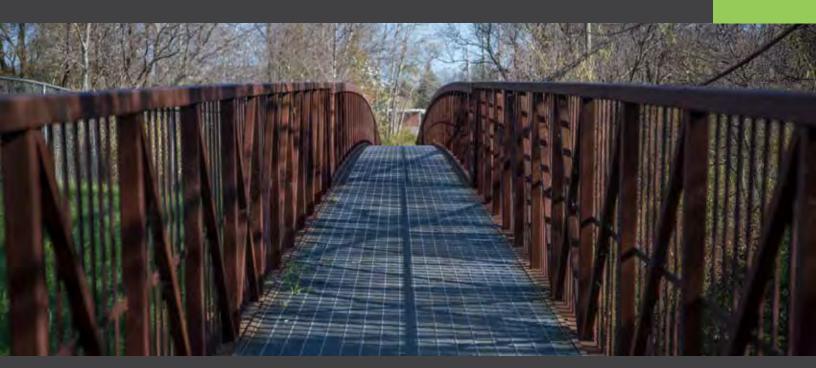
View of bridge connecting Emile Street and Bridge Street. November, 2017.
